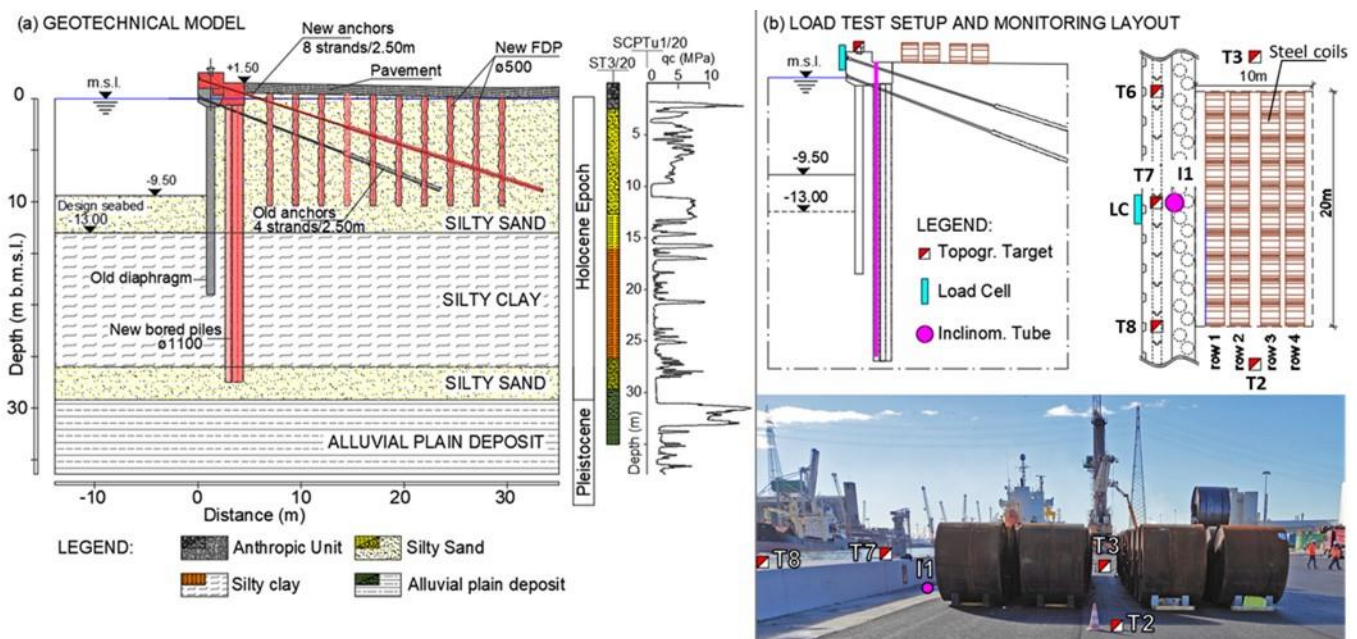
(a) Geotechnical model of the sheet pile quay wall; (b) Load test setup and monitoring layout
